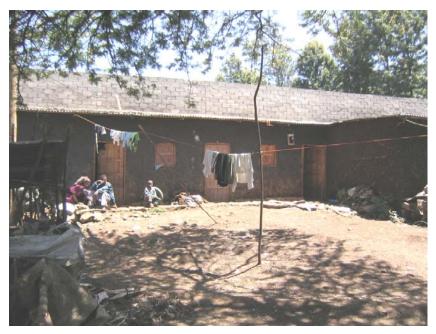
Picture of TSDA built houses. Floor plan indicated above
